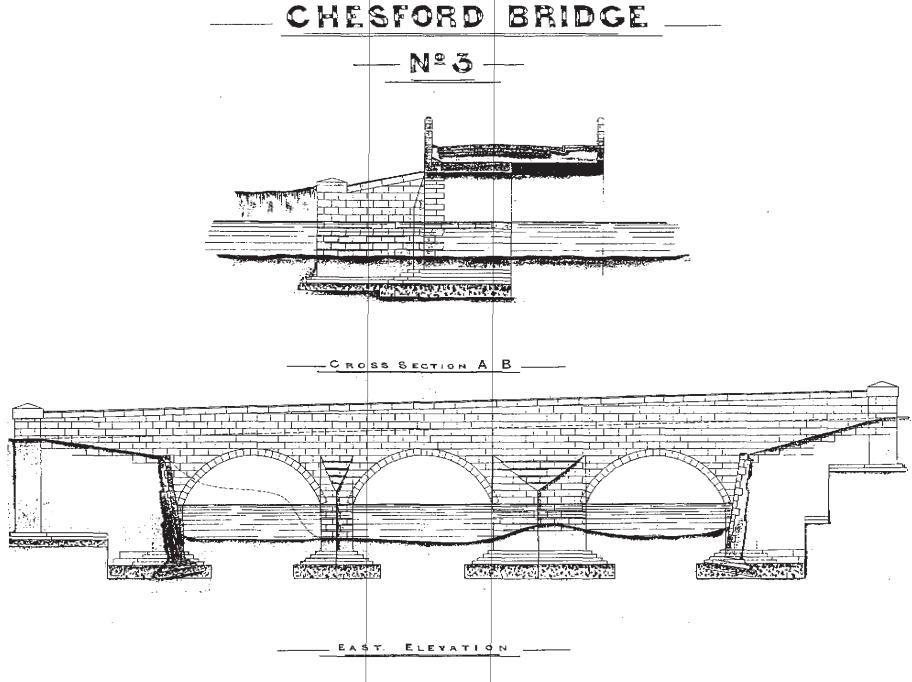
Chesford Bridge, 1892, details from plans for new bridge (WRO CR 1562/3)
